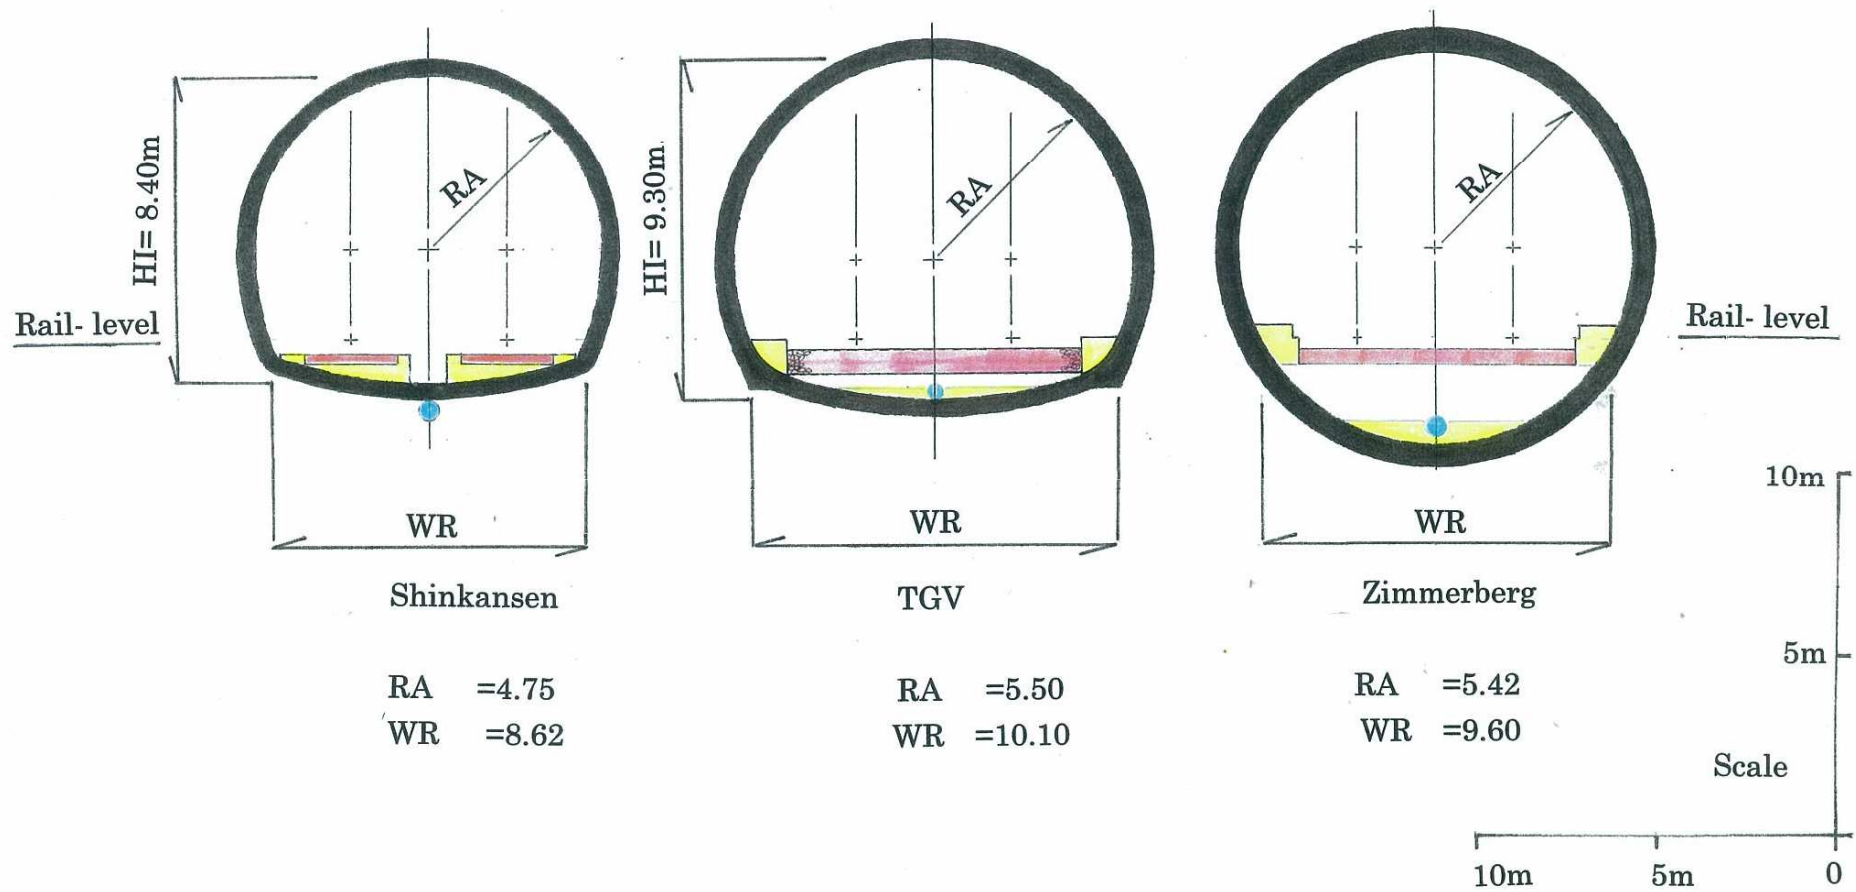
Inner Cross-section of Tunnels(double track) in High speed Railway.
